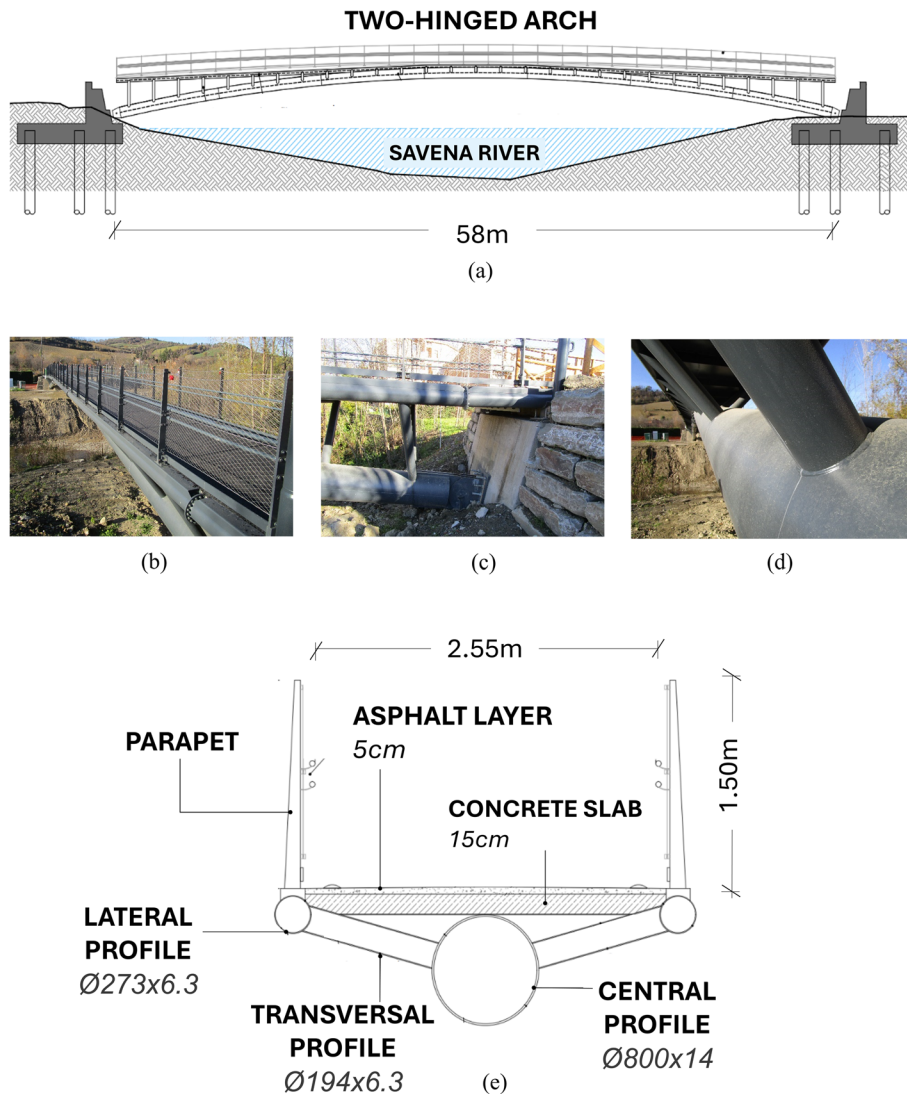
The pedestrian bridge in Pianoro: (a) lateral view, (b) bridge deck, (c) detail of the abutment, (d) detail of the transversal circular steel tubular profiles connecting the deck to the main arch, and (e) transversal cross-section at bridge midspan. (All measures, if not specified, are given in [mm])
